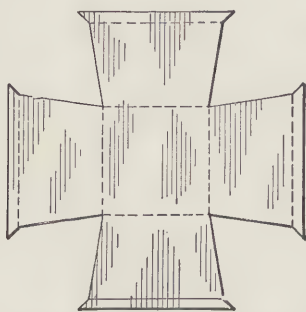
SLOP SINK LINING CUT TO WIPE CORNERS ONLY
